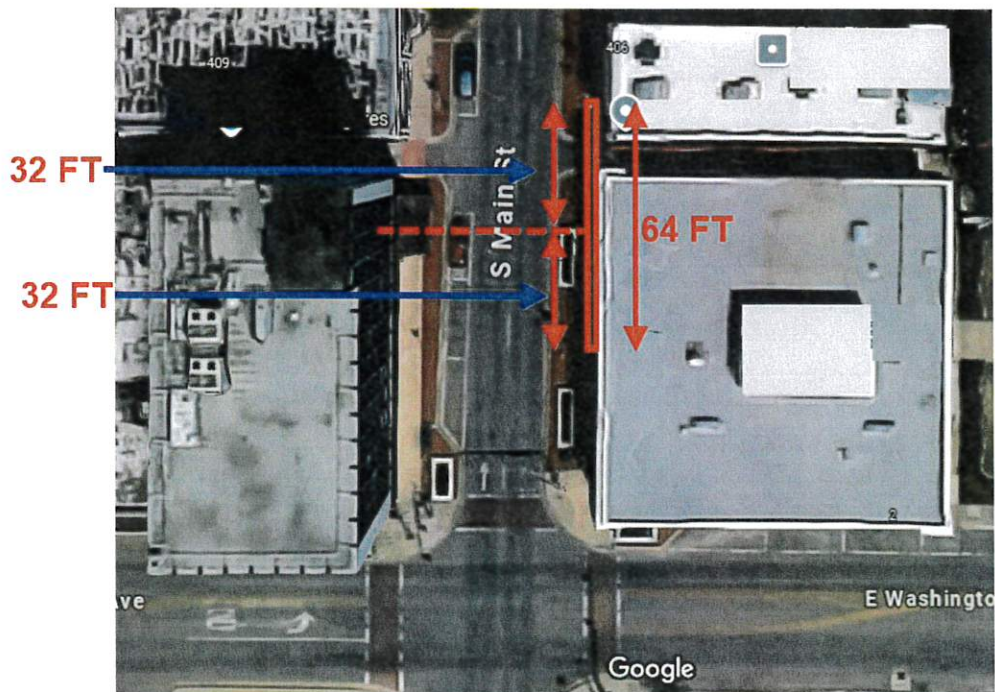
Aerial View Showing Recommended 2x6 Wood Protection Wall Location
